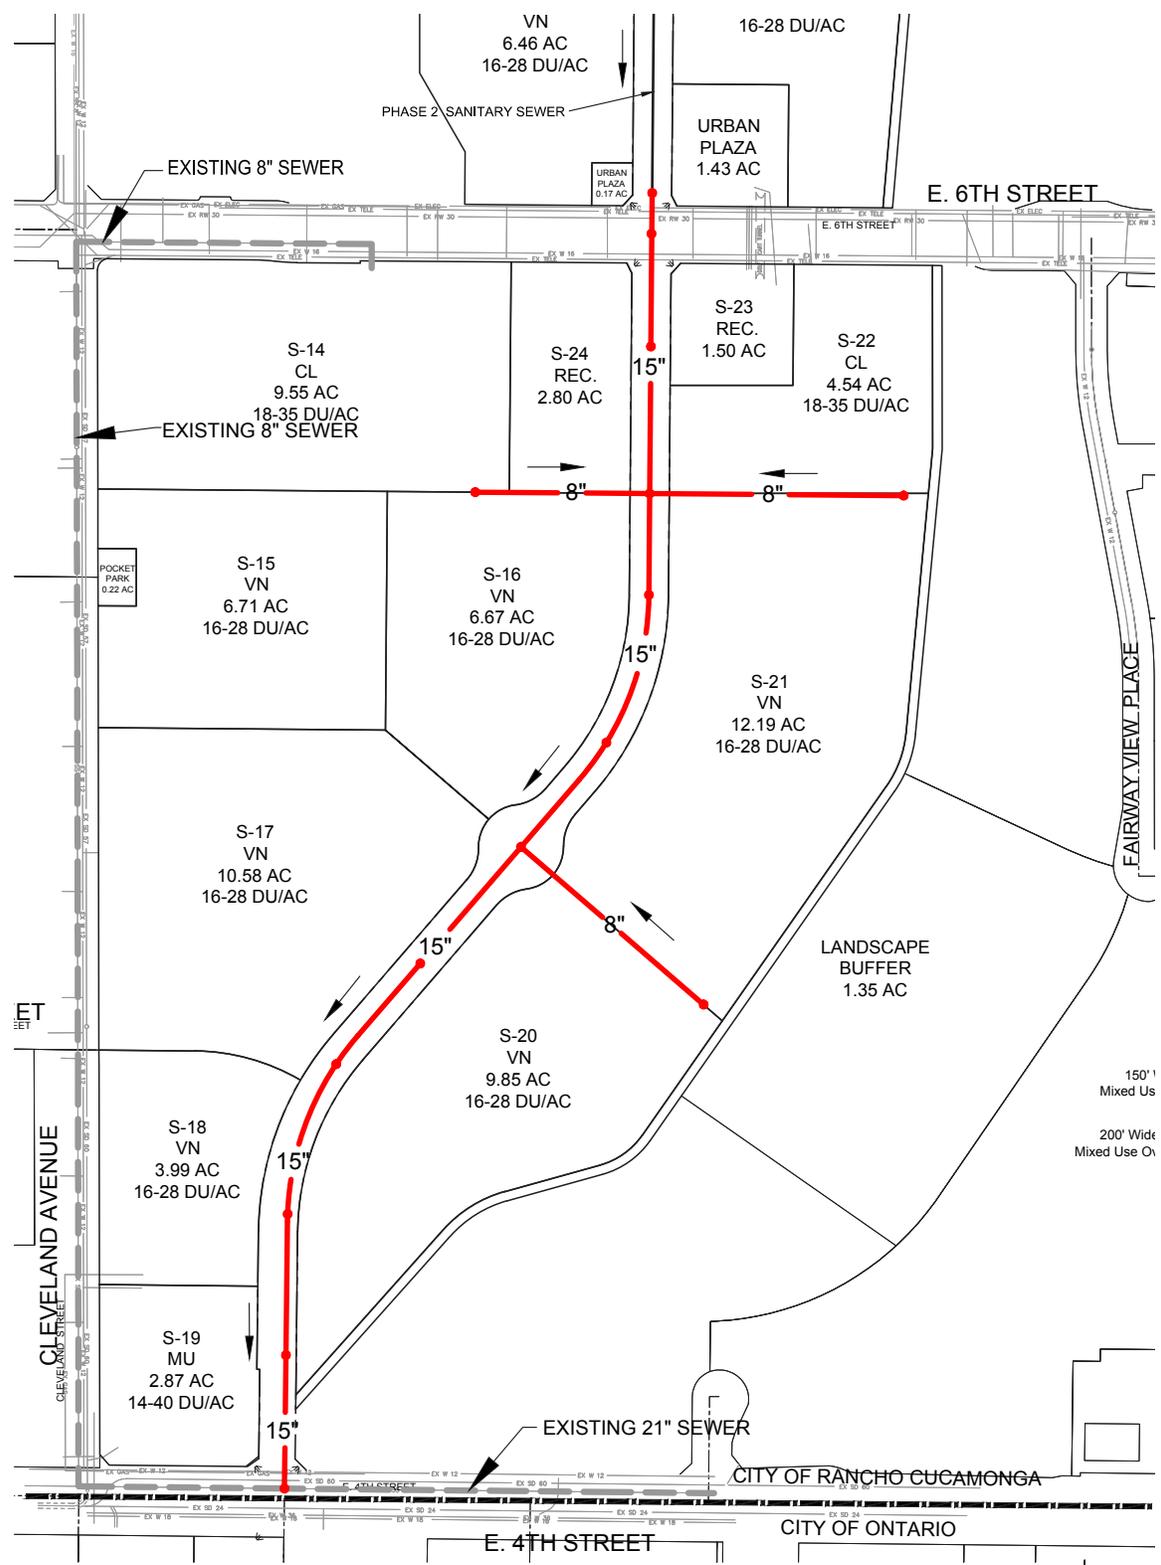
Conceptual Phase 1 Sanitary Sewer Facilities Plan
